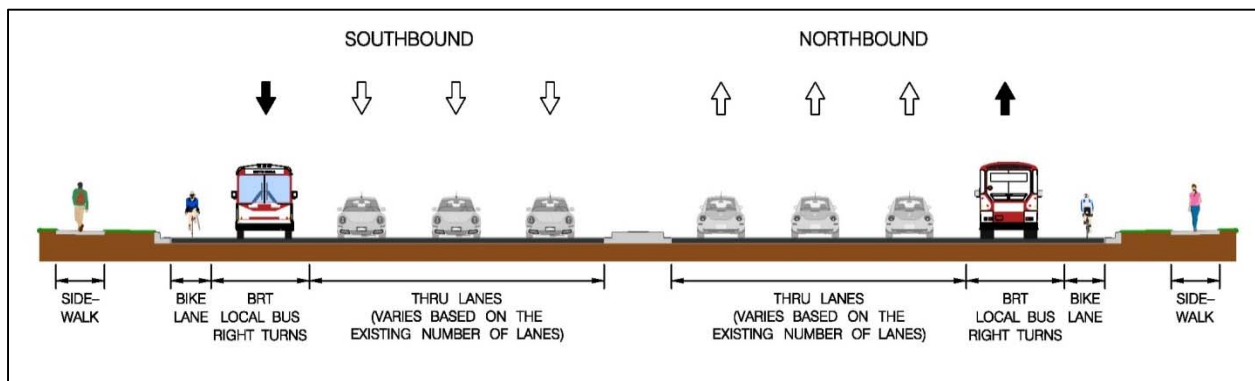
Alternative 4B - Section 1: Bethesda - AM Peak Period – Pooks Hill Road to Jones Bridge Road
